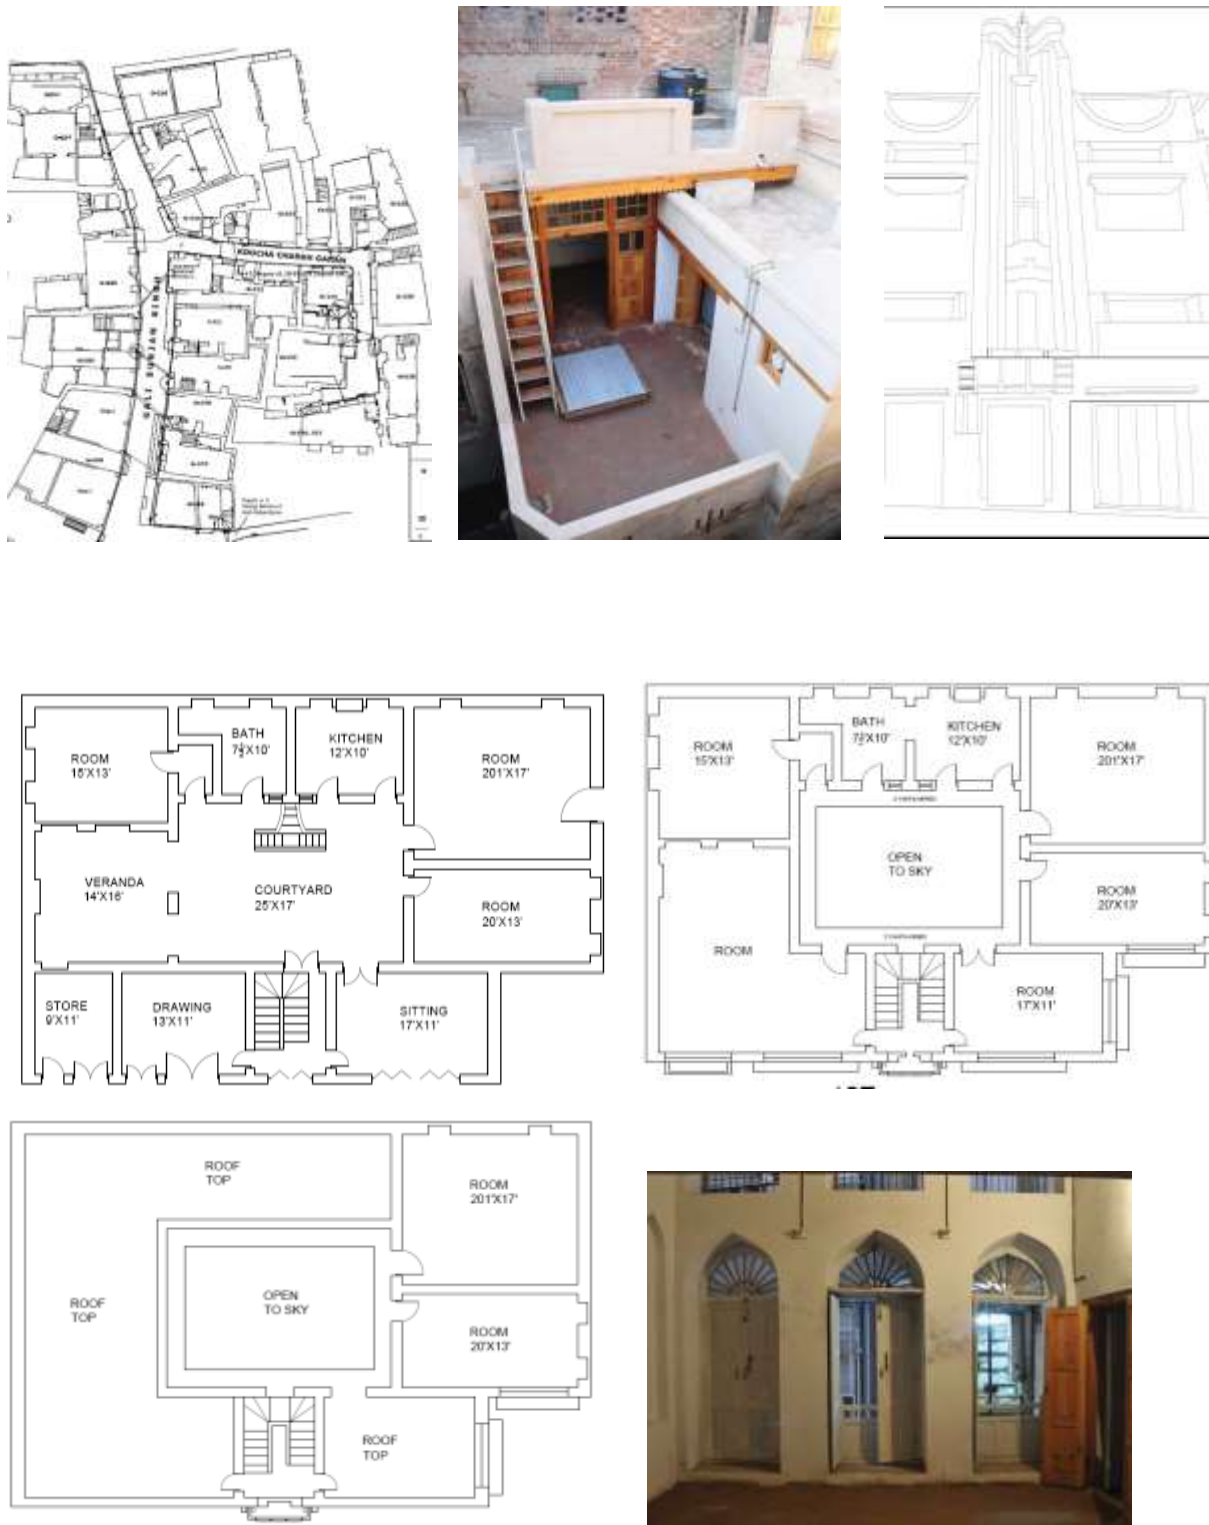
House No-3 (Lahori Haveli) in the Walled City of Lahore-Pakistan (Gulzar, 2016)
